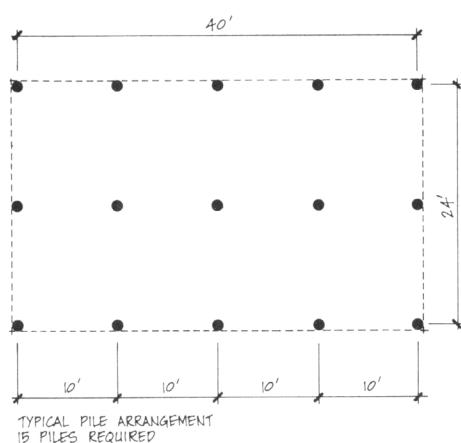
Cantilever Used to Reduce Number of Foundation Elements
